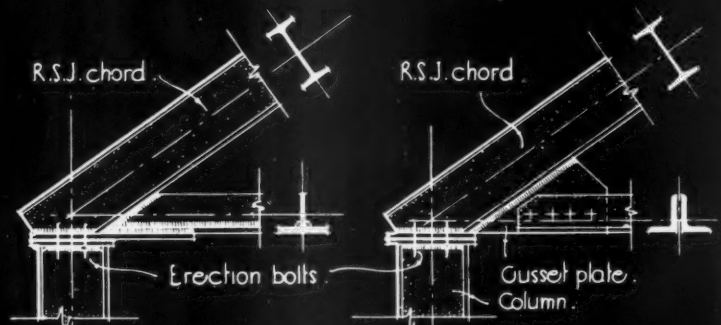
ALTERNATIVE ARRANGEMENTS OF SITE CONNECTION AT POINT A.
